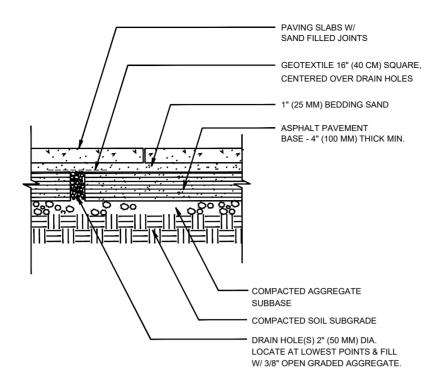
A typical cross section with an asphalt base and sand-set paving slabs
